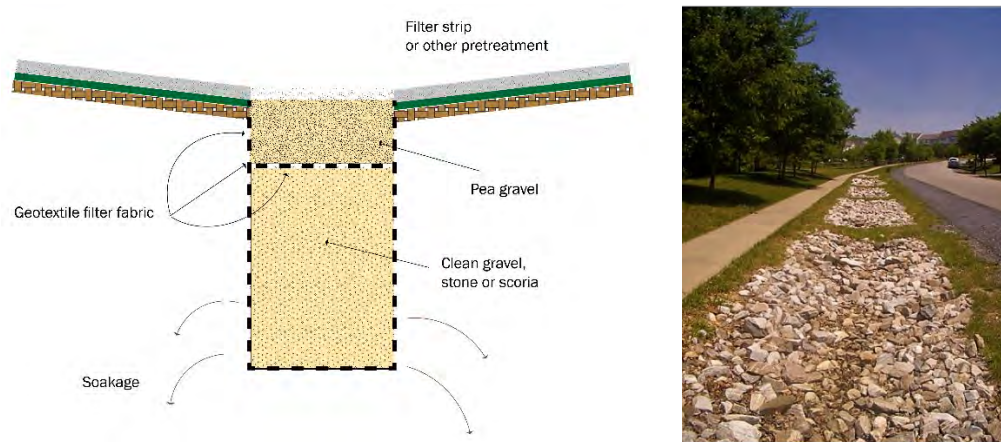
Cross-section through an infiltration trench (left). An infiltration trench constructed on the road side(right) (Source: sswm.info)
